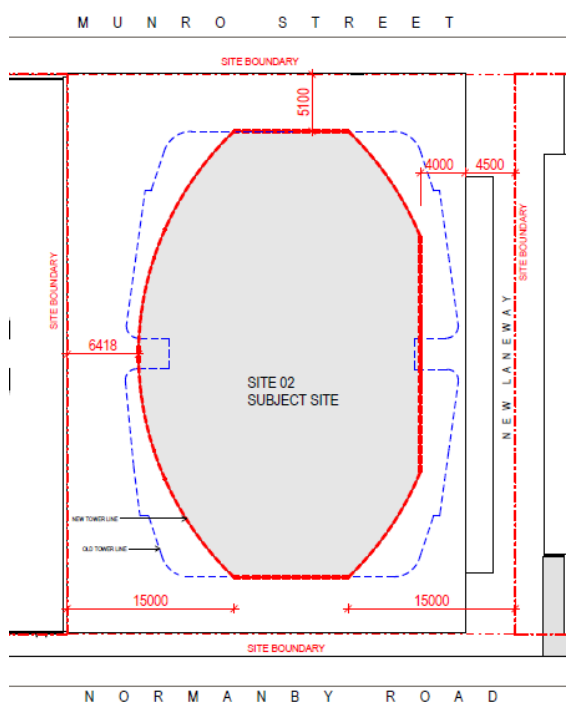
Floorplan of 256-262 Normanby Road – red outline indicates approved town for and setbacks.
